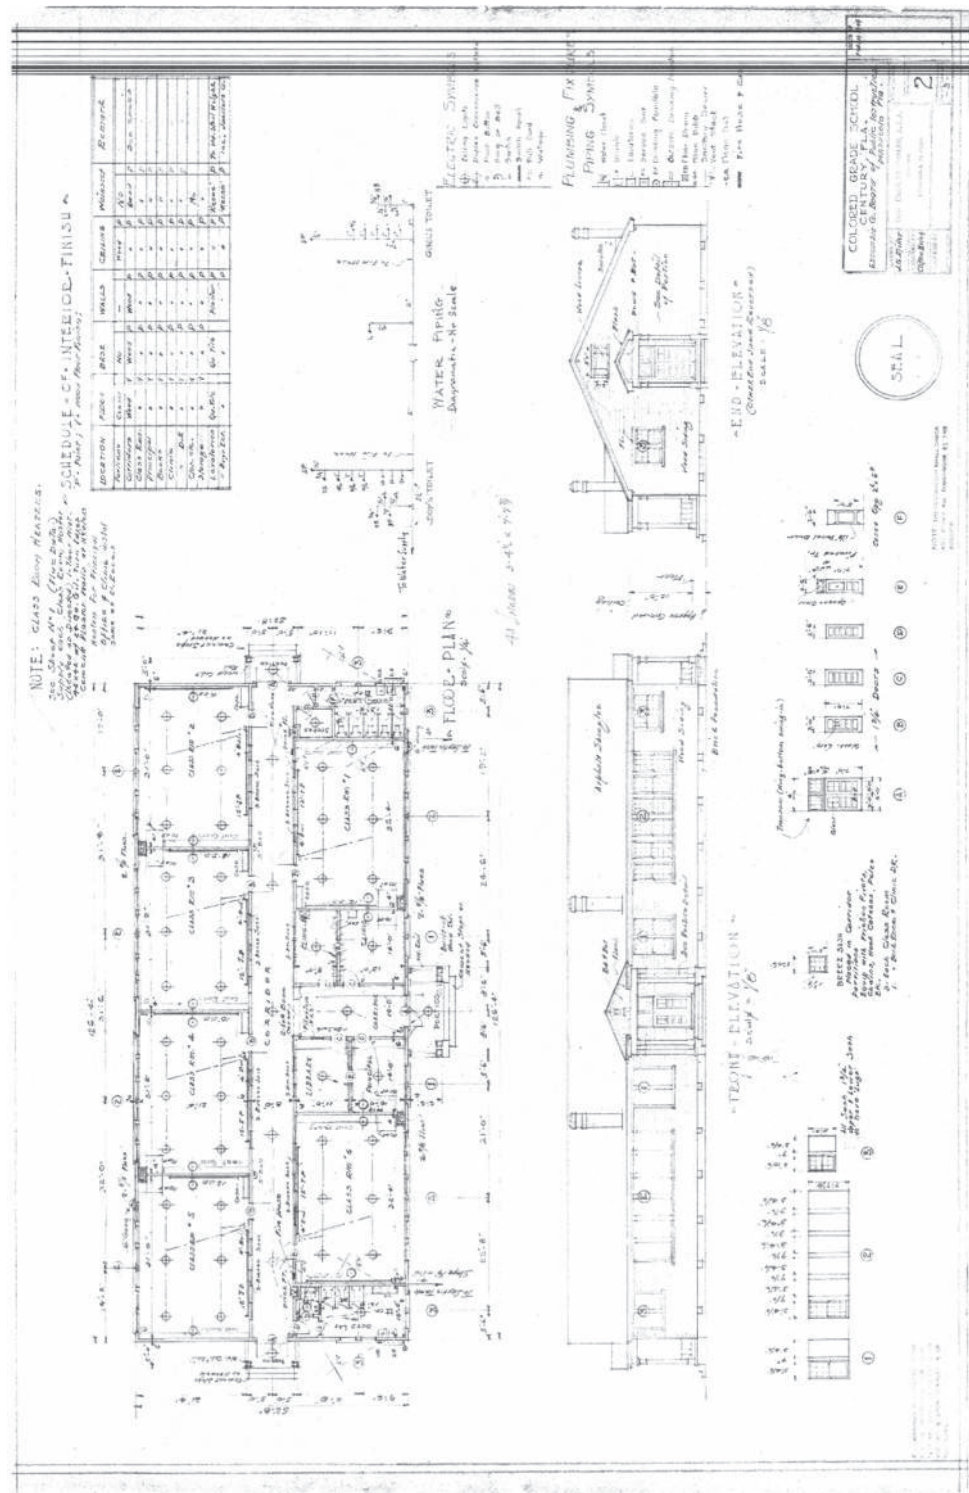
EXHIBIT B – ORIGINAL CONSTRUCTION DRAWINGS
